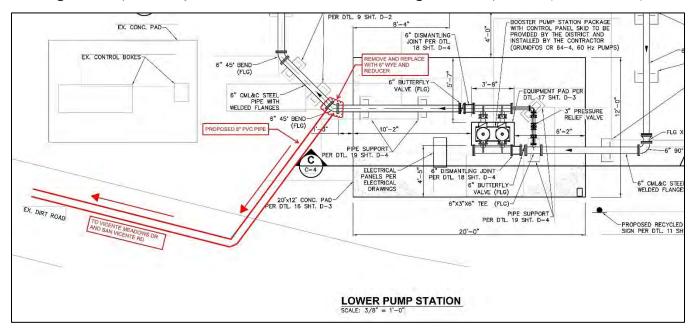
Proposed Recycled Water Connection Point at Existing Lower Pump Station (Source: Dudek)
